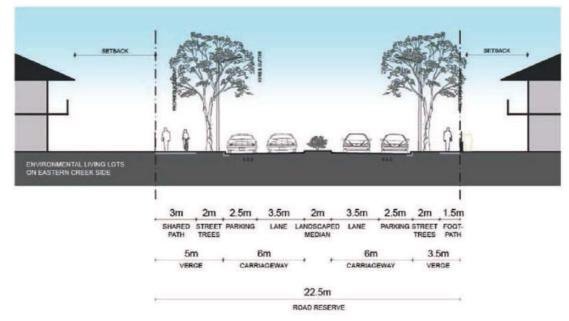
Sub-Arterial Road Cross Section (Plan)
